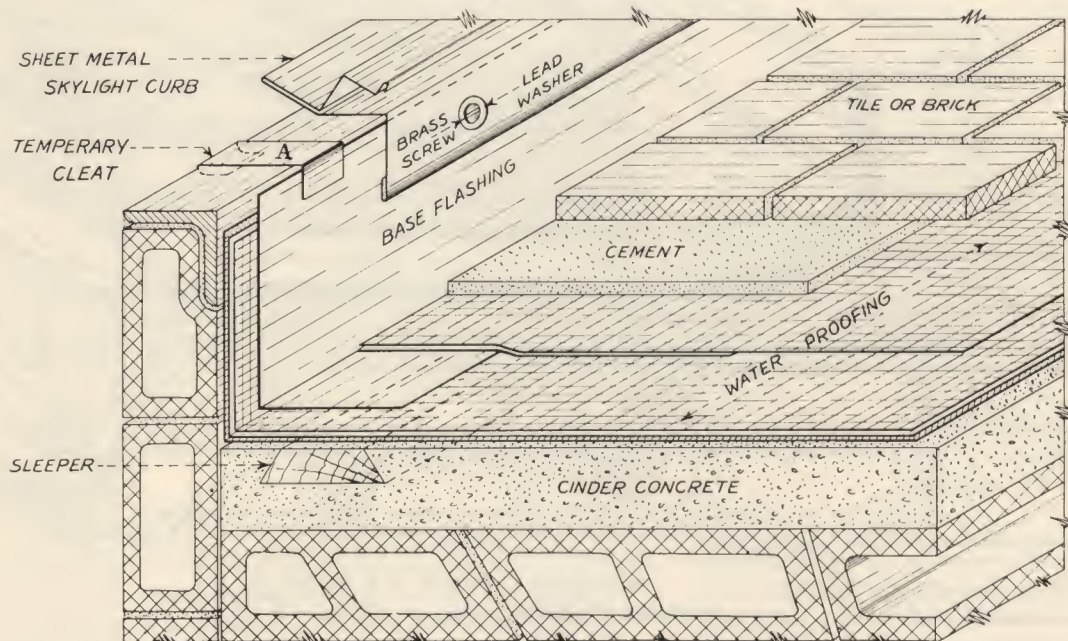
FLASHING SKYLIGHT FRAME IN CONNECTION WITH TILE OR BRICK ROOFING SCALE - $1\frac{1}{2}''=1'-0''$
